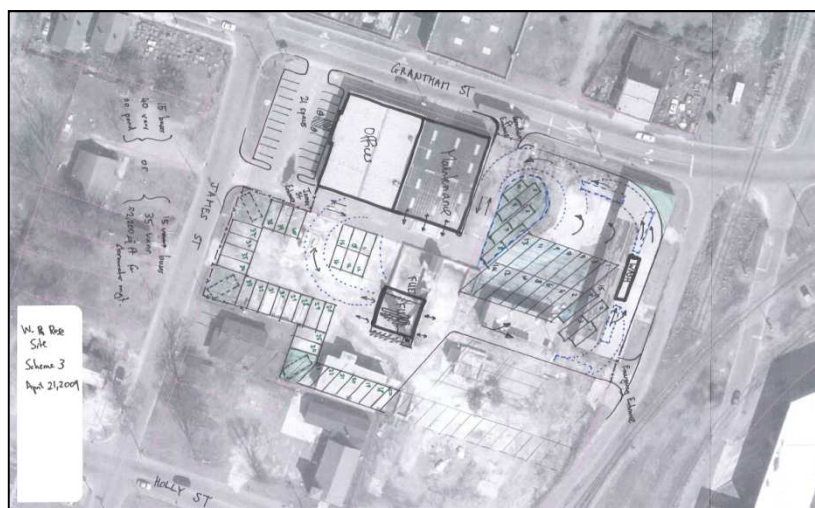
W. P. Rose Site Layout – Alternative Design Sketch 1
